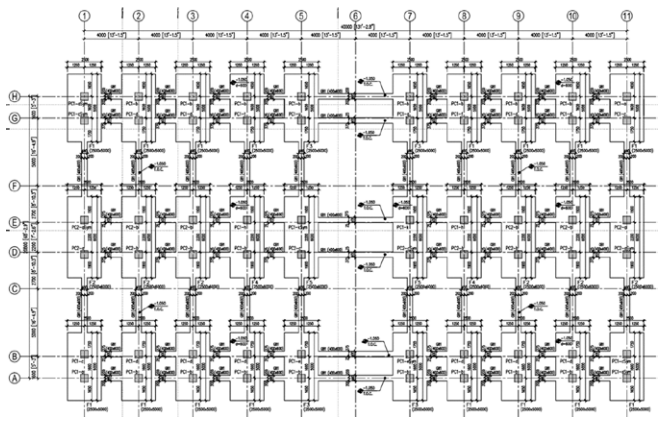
PLAN OF CAST-IN-PLACE FOUNDATION SYSTEM
